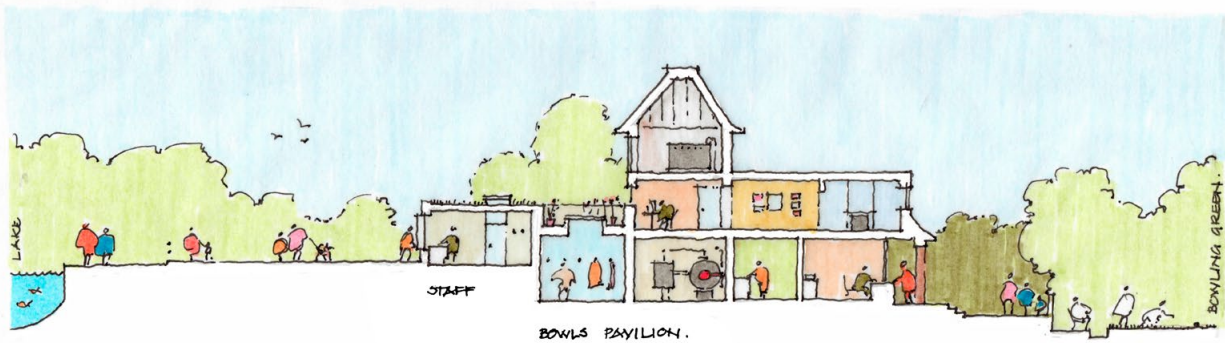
Bowls Pavilion: Sketch section, showing new extension
